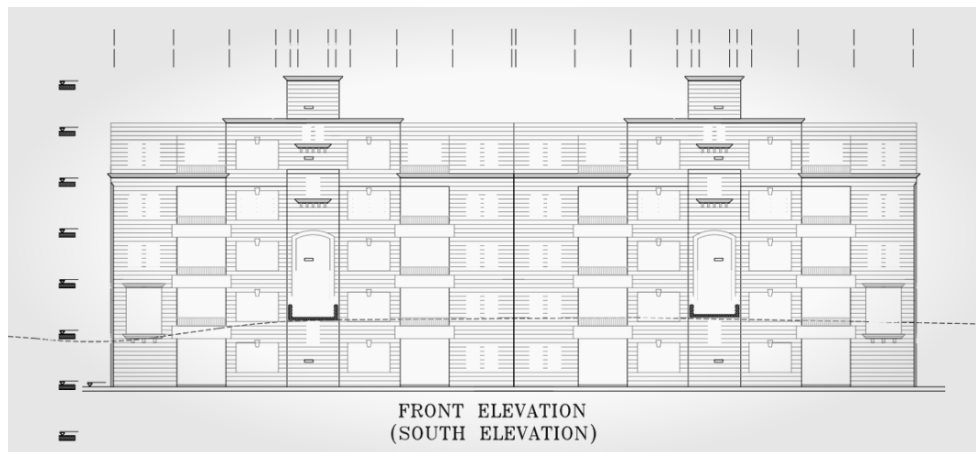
Elevation design (Engineering House Consulting Company)
